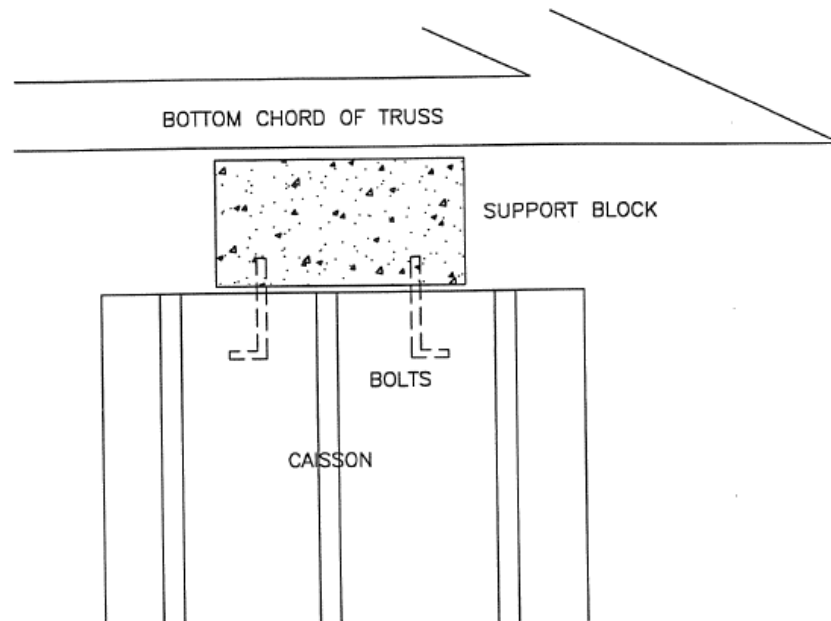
Caisson and Support System for the Rio Bananito Railway Bridge (After McGuire, 1994)
